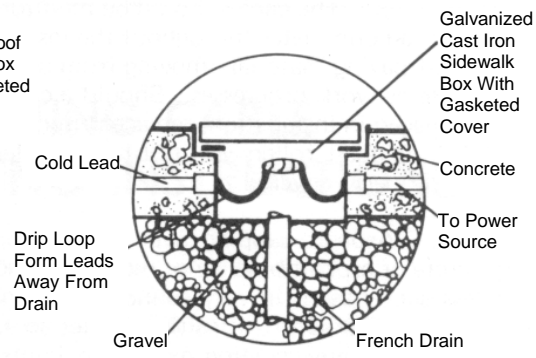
E SIDEWALK JUNCTION BOX ARRANGEMENT AT GRADE LEVEL
